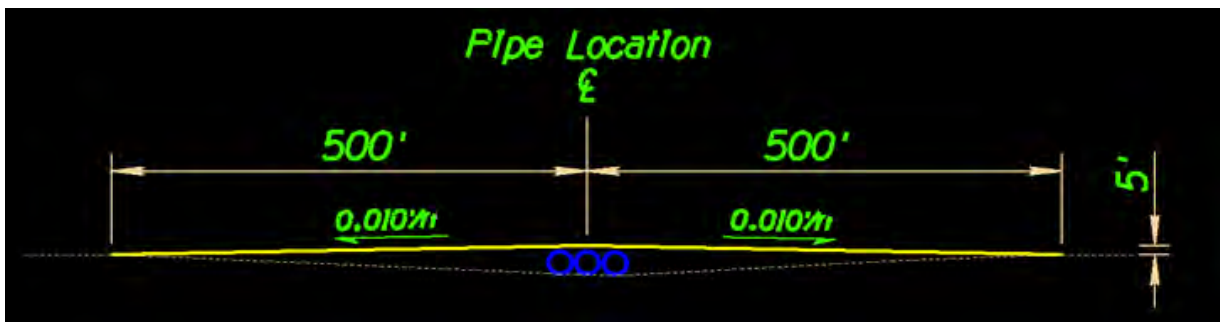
Proposed Typical Longitudinal Section for the new Culvert Locations
